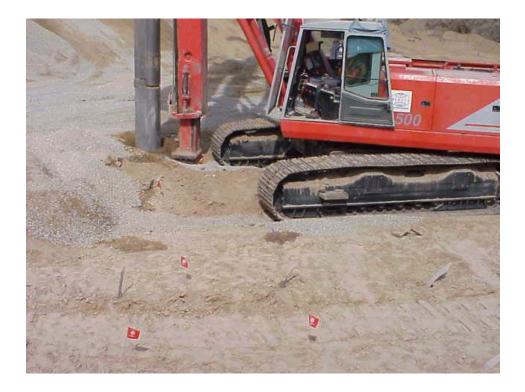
Photo of water draining from the wick drains during installation of a stone column.
